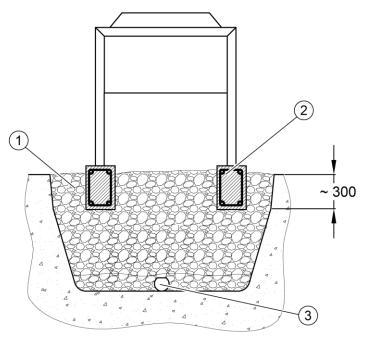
Strip foundation for VHS-M 80 evaporator (in mm)
